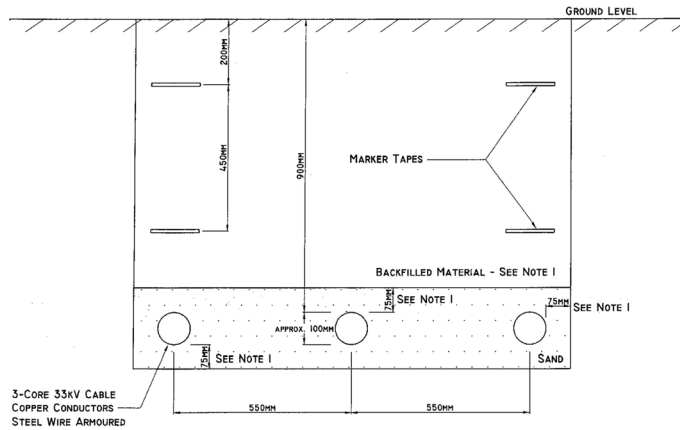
A typical cable trench layout schematic (Courtesy of Econnect Ltd)
